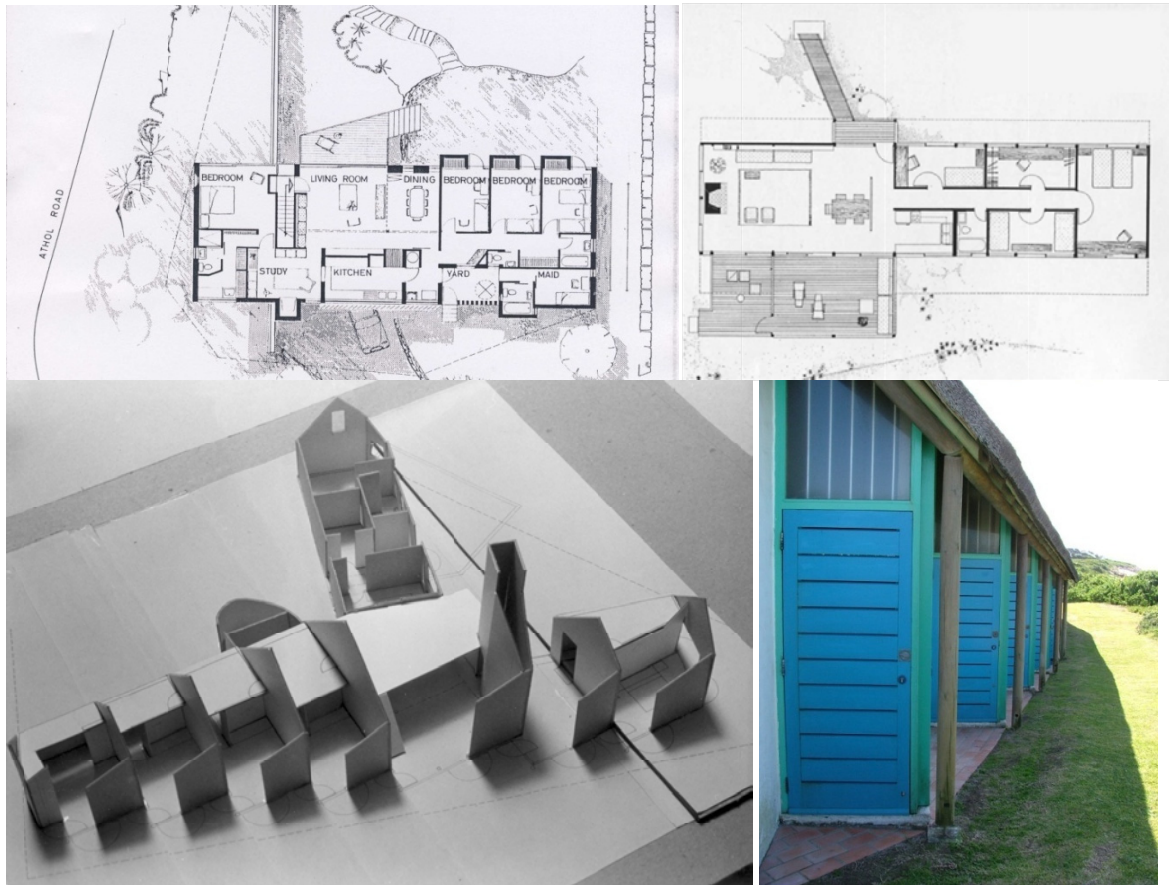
Top left: Ground floor plan, House Bertie-Roberts, Camps Bay (1965) (Anon, 1968:12). Top right: Plan, House Stillman, Massachusetts, Marcel Breuer (Breuer, 1962:151). Bottom left: Model, House Swanepoel, Cape St. Francis (1980) (Fagan archive - Job No. 8011, undated). Bottom right: Framed roof support, House Swanepoel, Cape St. Francis (1980) (Author, 2005).
